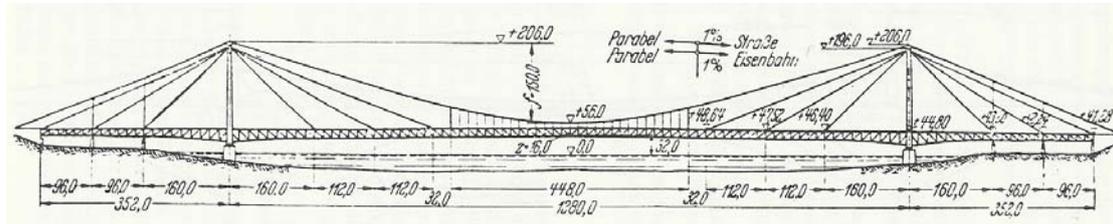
Dischinger's Combination of Suspension and Cable-stayed Bridge System
